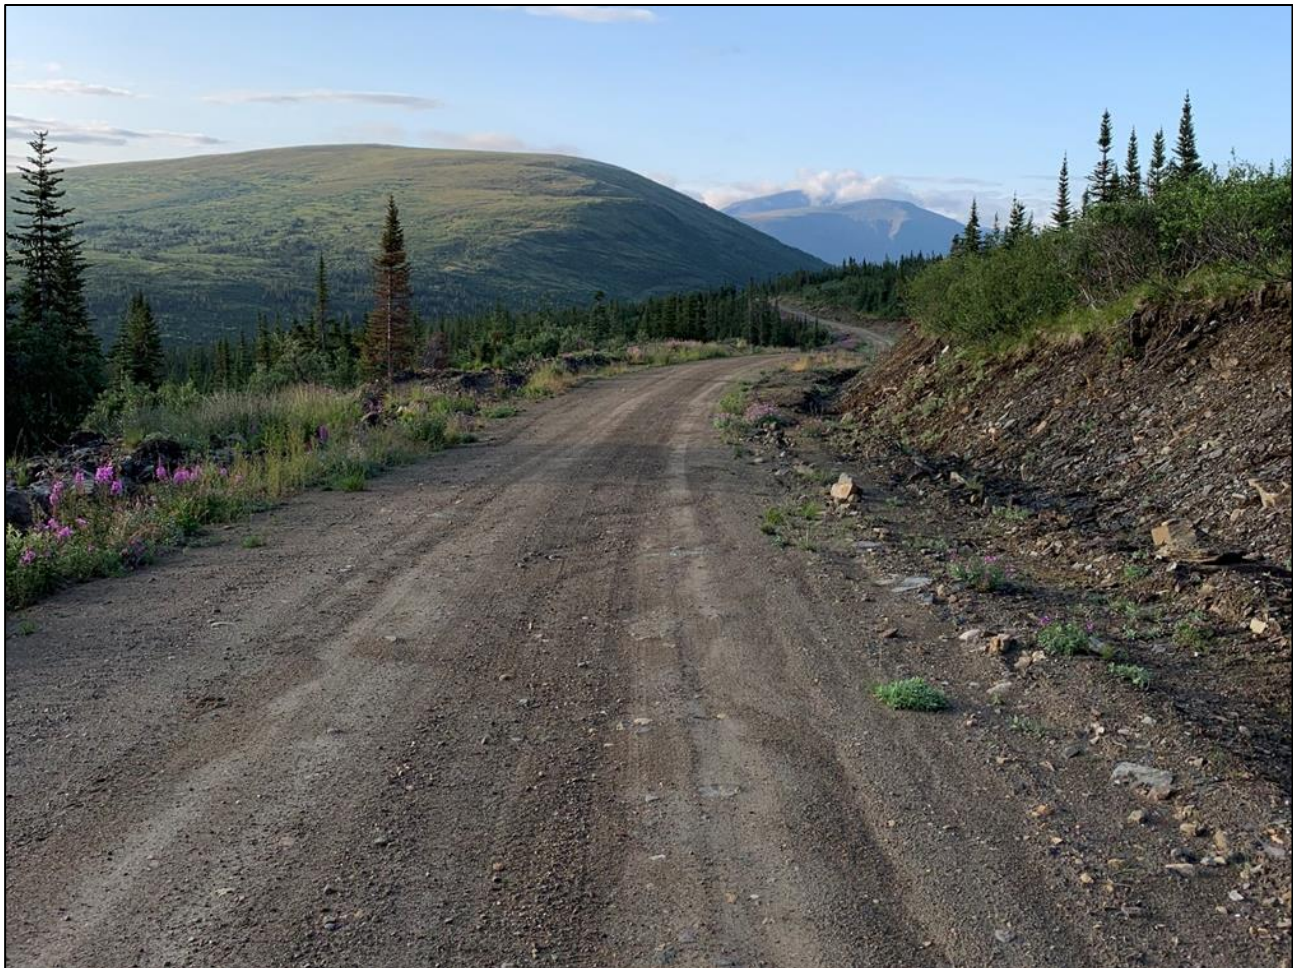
View of the Tote Road (looking south toward the Process Plant and Mining Area)
